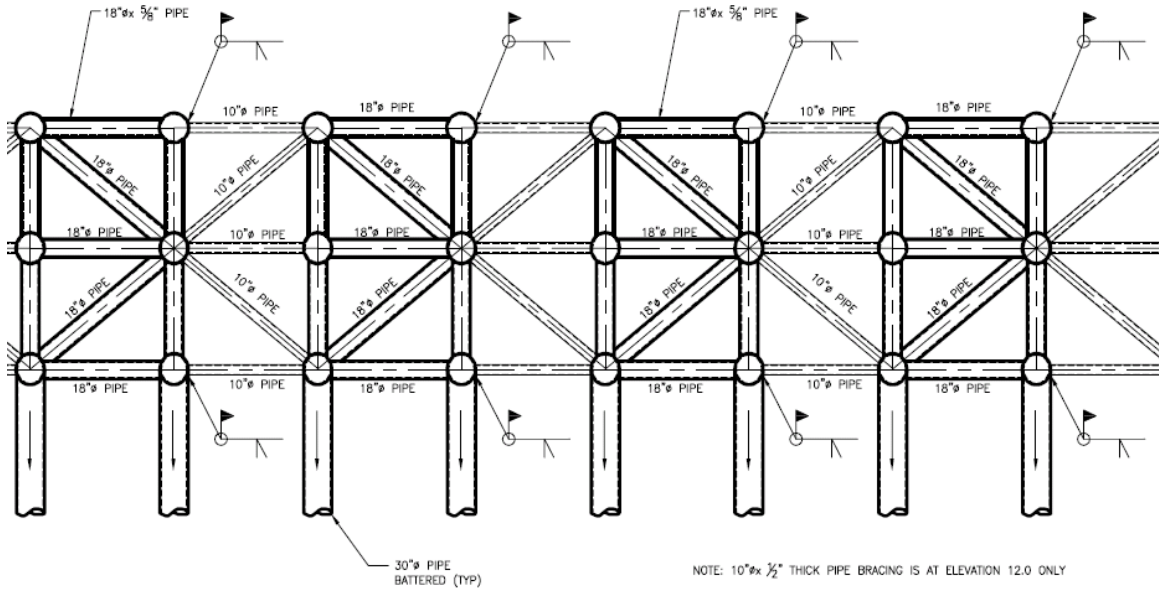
London Avenue Phase 1 Superstructure Partial Plan
